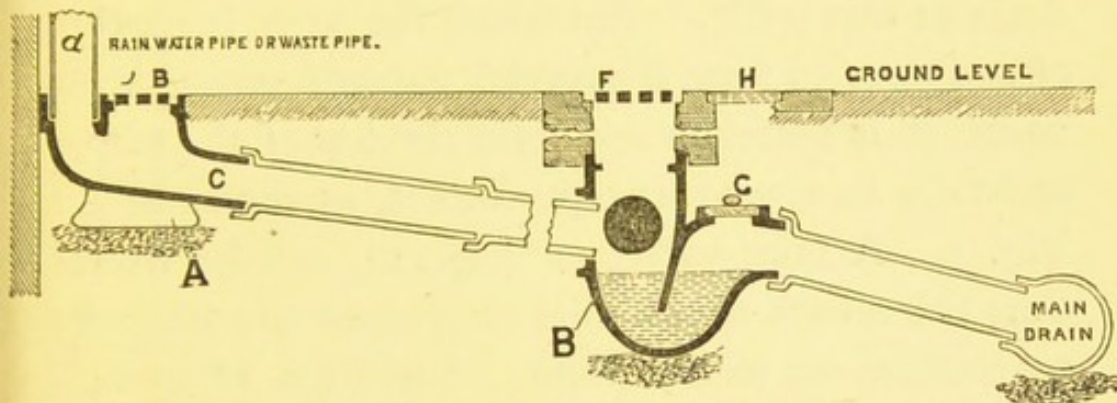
Section of a "Ventilating Drain-connector," showing its connection with a R. W.-pipe and Drain.
